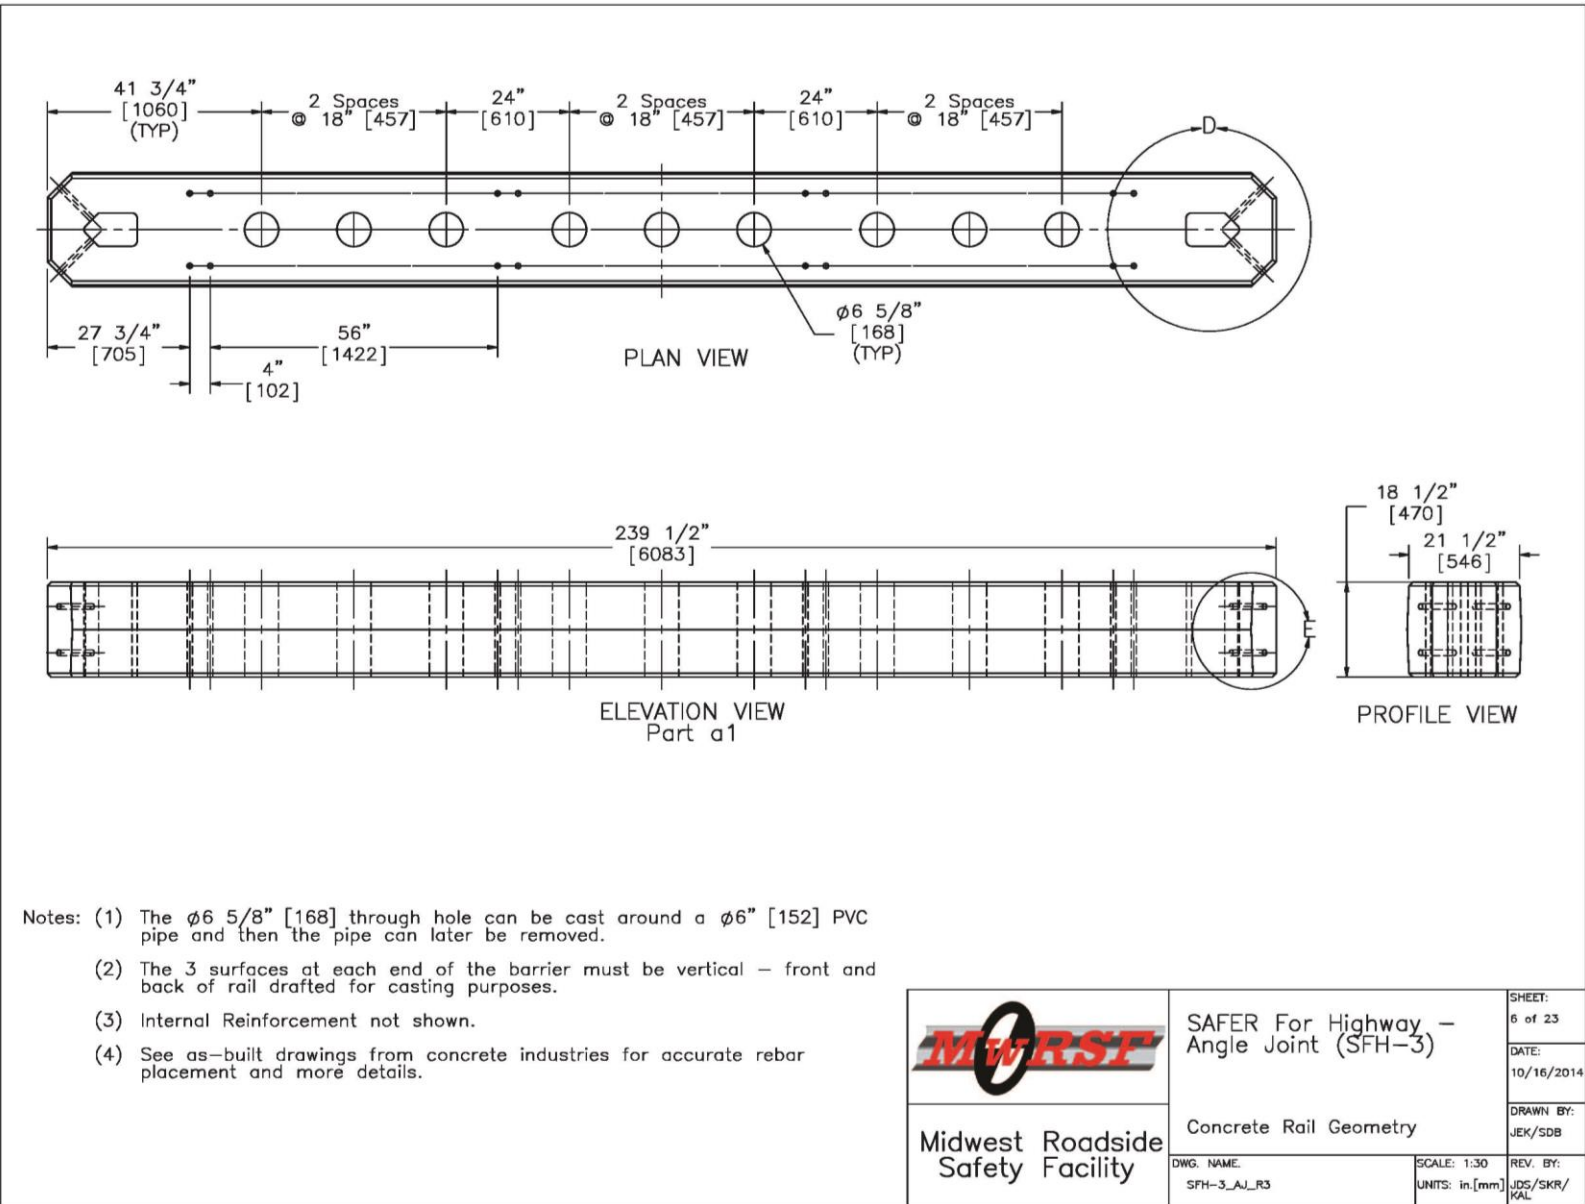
Concrete Beam Geometry, Test No. SFH-3
